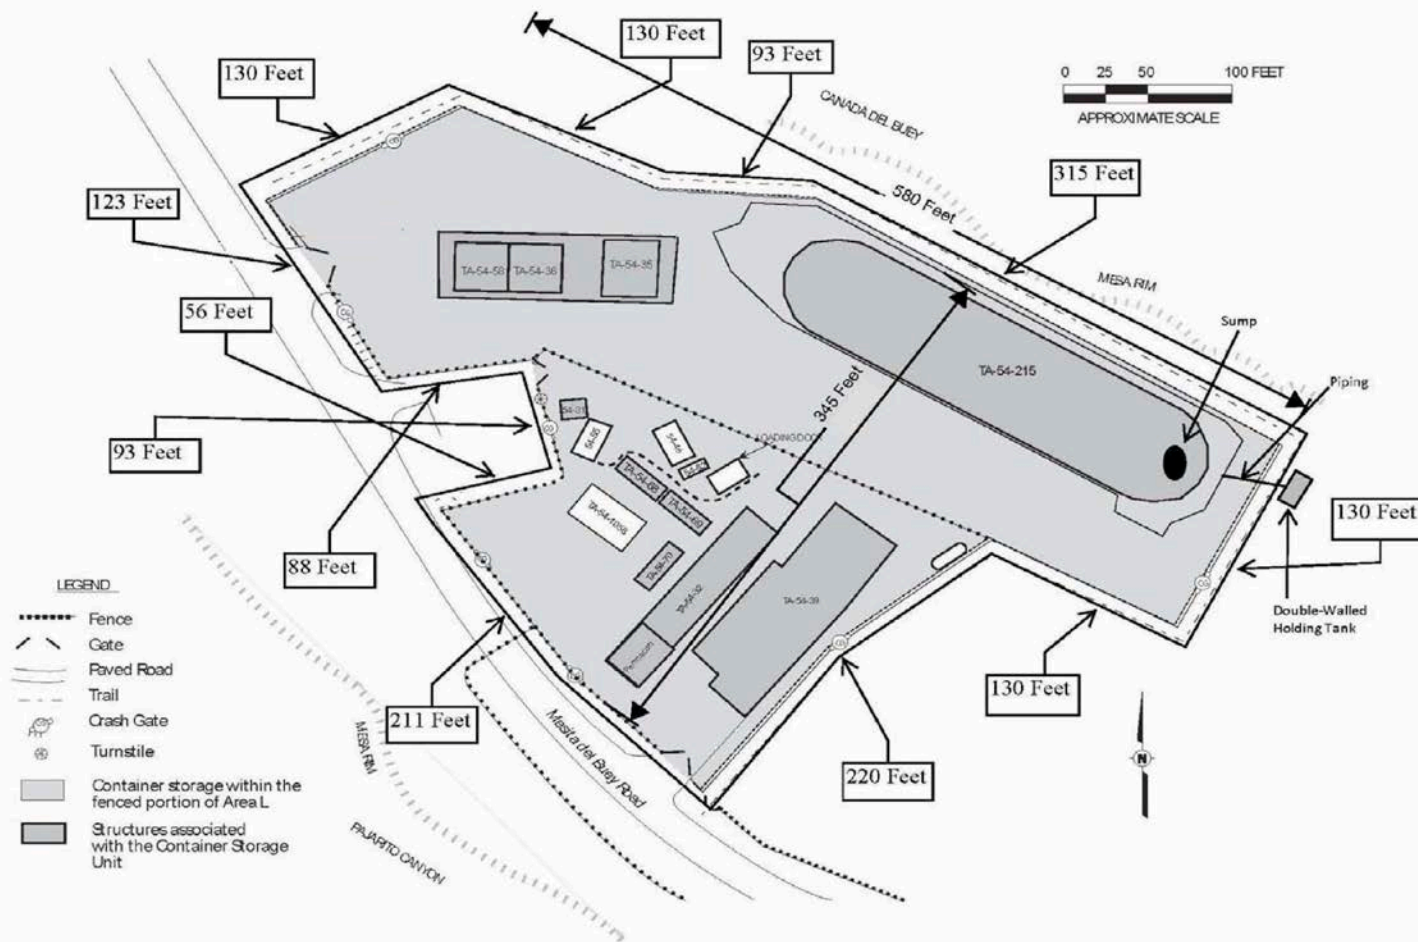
Technical Area 54, Area L, Outdoor Container Storage Unit Sampling Grid and Dimensions
